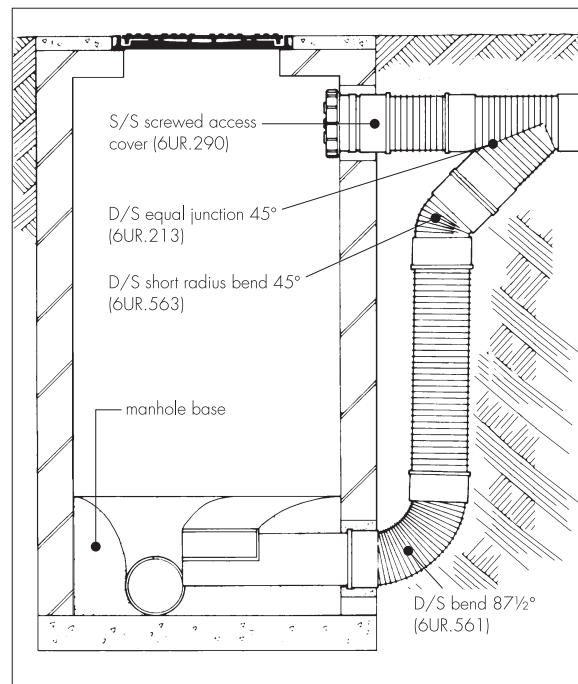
Manhole with backdrop — typical installation of screwed access cover
